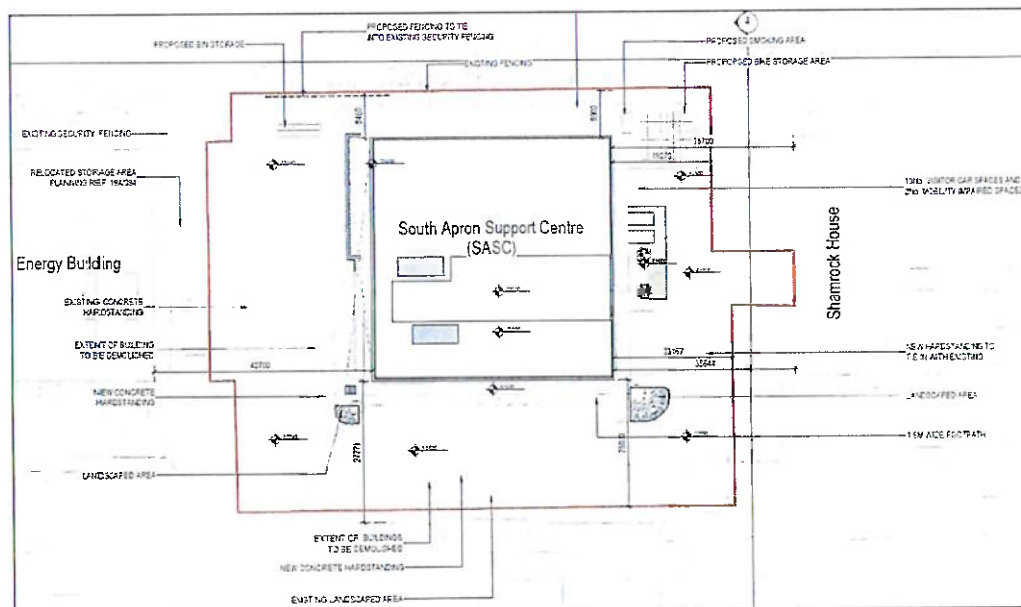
Proposed SASC site layout plan. (Pascall + Watson, 2023).
